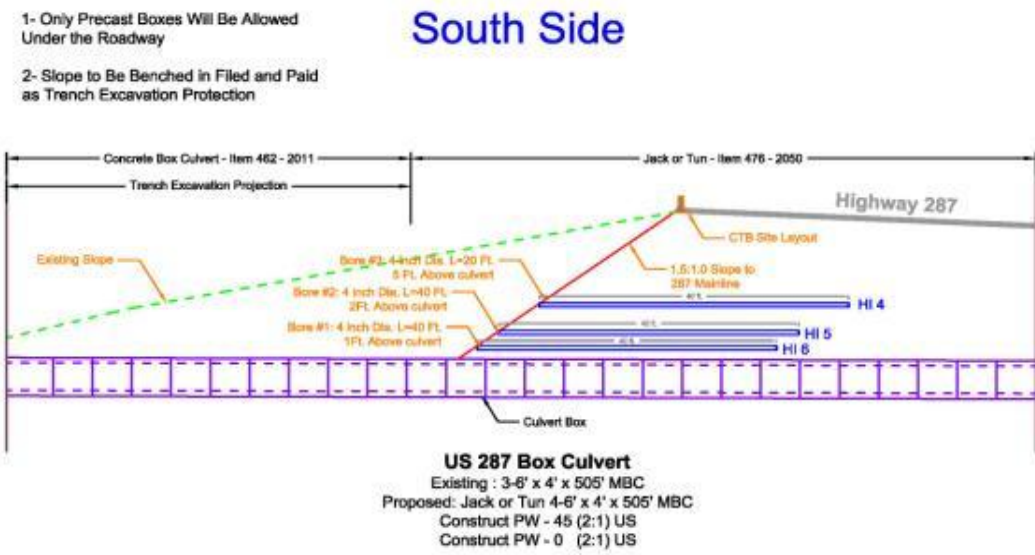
Incliner Installation Plan South Side (Tavakoli, 2012)
